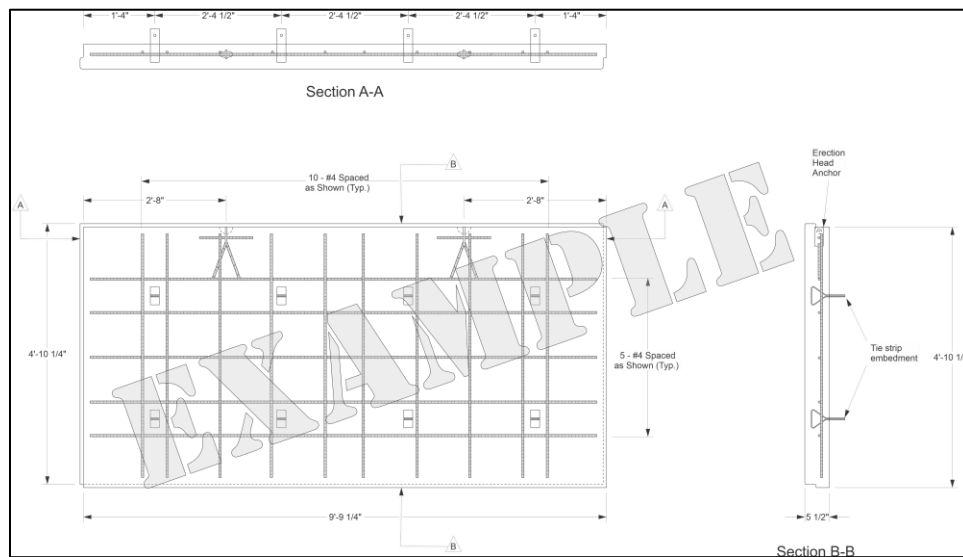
Example MSE wall pre-cast facing panel shop drawings
